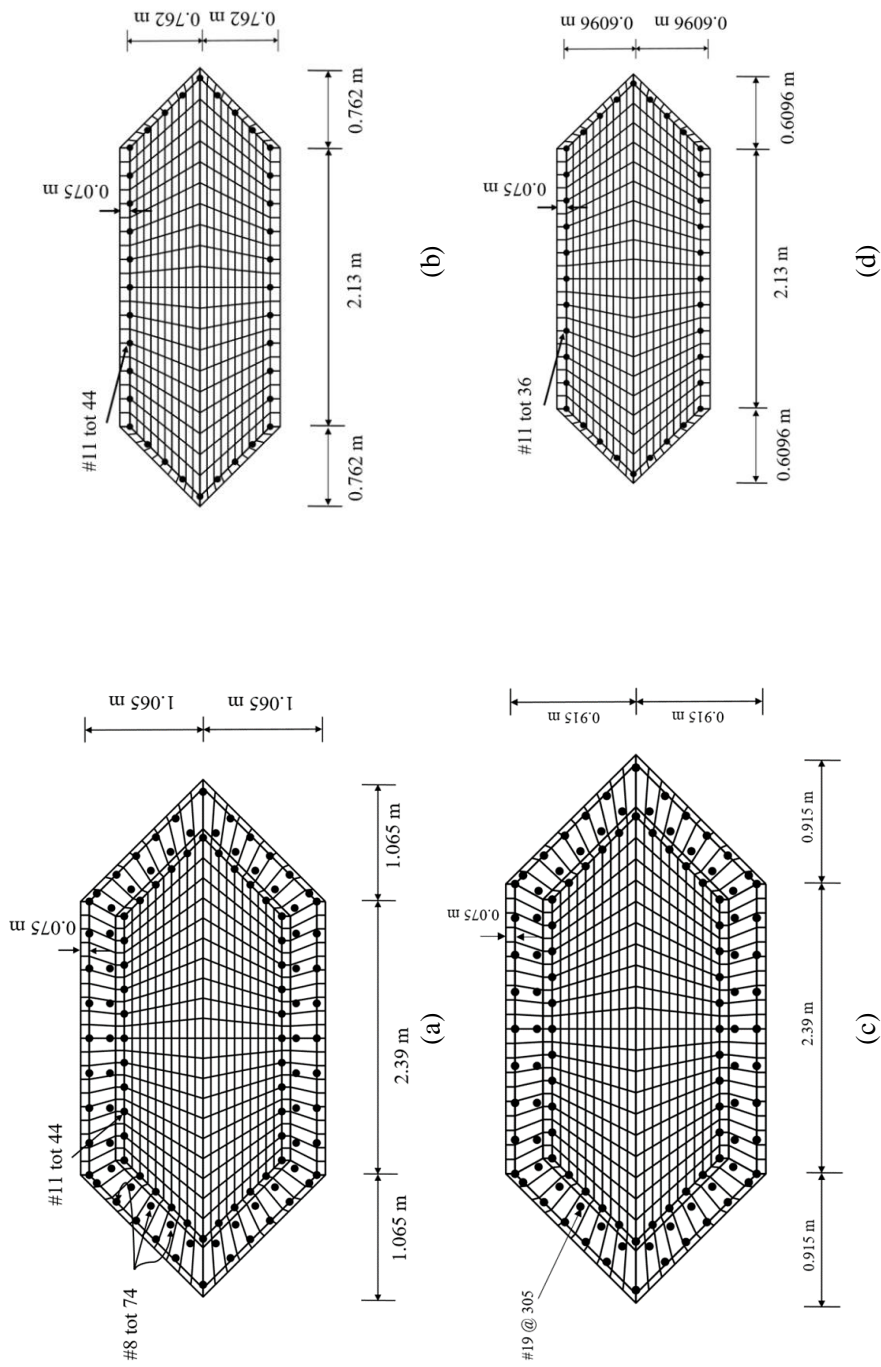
Fiber discretization of bridge column cross-sections: (a) Pier S-8 after retrofit; (b) Pier S-8 before retrofit; (c) Pier S-14 after retrofit; and (d) Pier S-14 before retrofit
